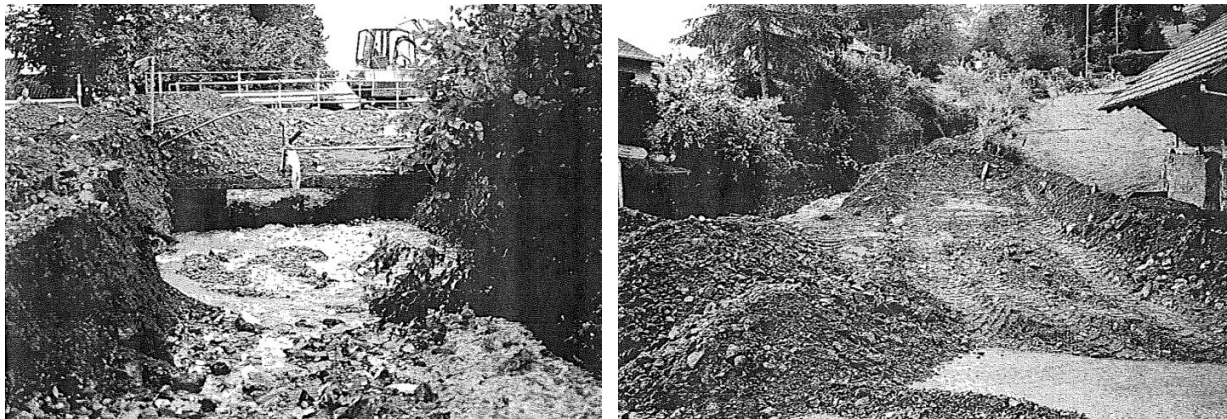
Downstream picture of the blocked and overflow main road bridge (left) and upstream picture of the debris-flow deposit remains between Krattigerstrasse and main road (right). (Event cadastre, 1987)
